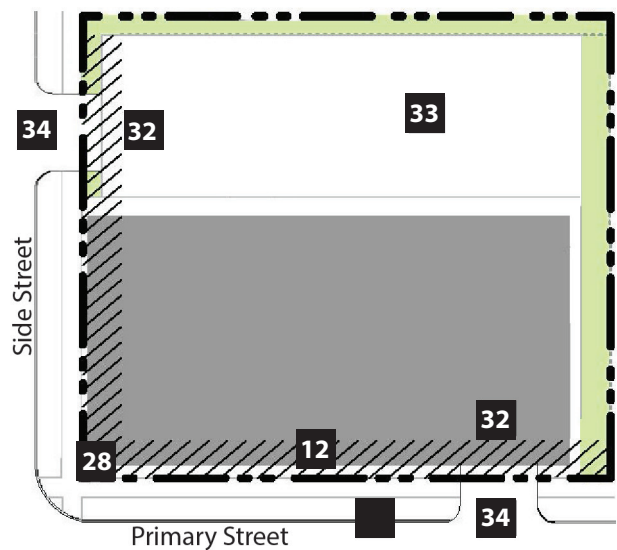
Limited bay building siting diagram shown with rear vehicular access and the vehicle bay on the primary street. Not to scale.
